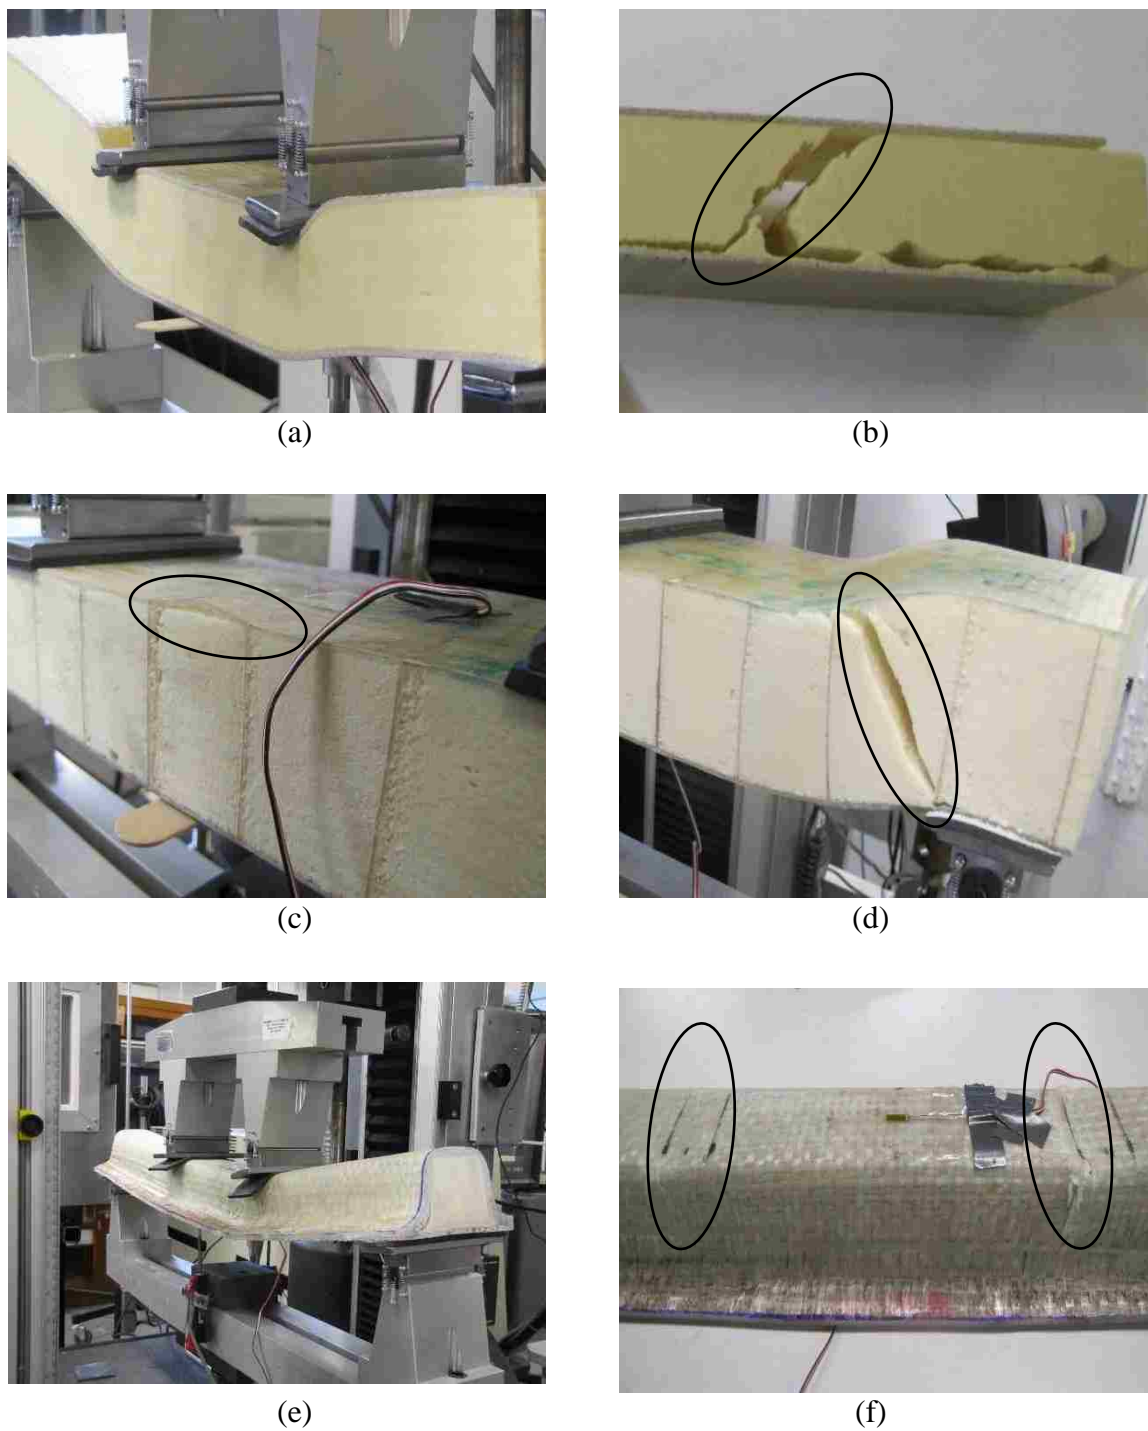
Failure modes: (a) bending fracture, (b) shear failure in Type 1, (c) intercellular buckling, (d) shear failure in Type 2, (e) deformed shape during testing, and (f) compression failure under loading points in Type 3
